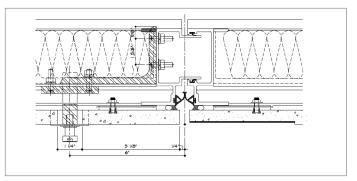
Sealed curtain wall with A/UHPC mechanical fastening
